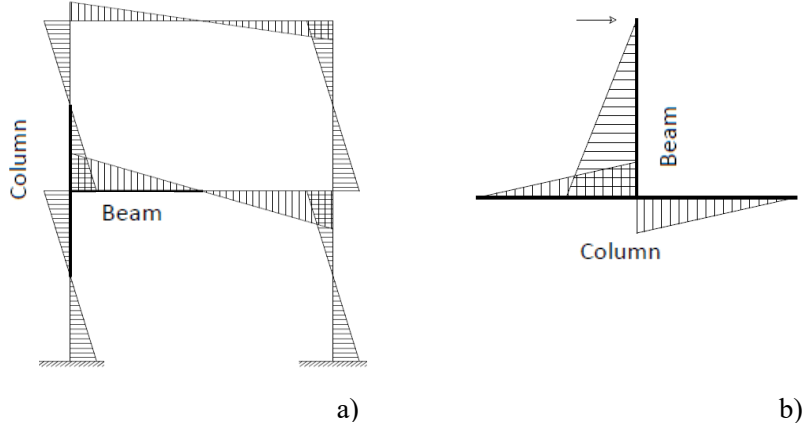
Analyzed beam-to-column steel joint: a) real configuration of the joint embedded in a typical steel frame; b) laboratory test configuration.
